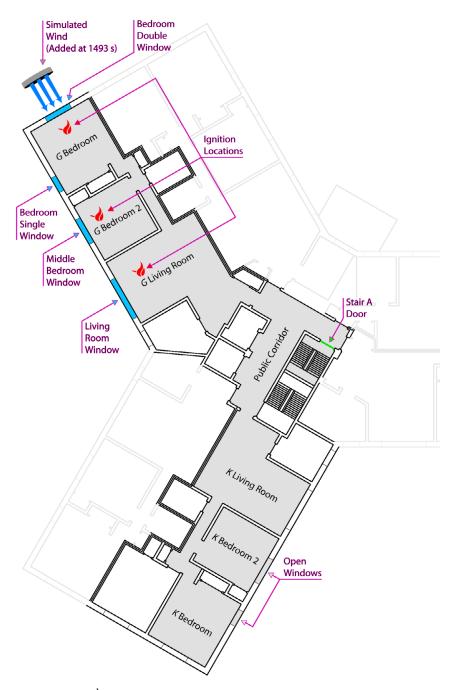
$3^{rd}$  floor apartment G and K floor plans with locations pertinent to Experiment 3G/K
